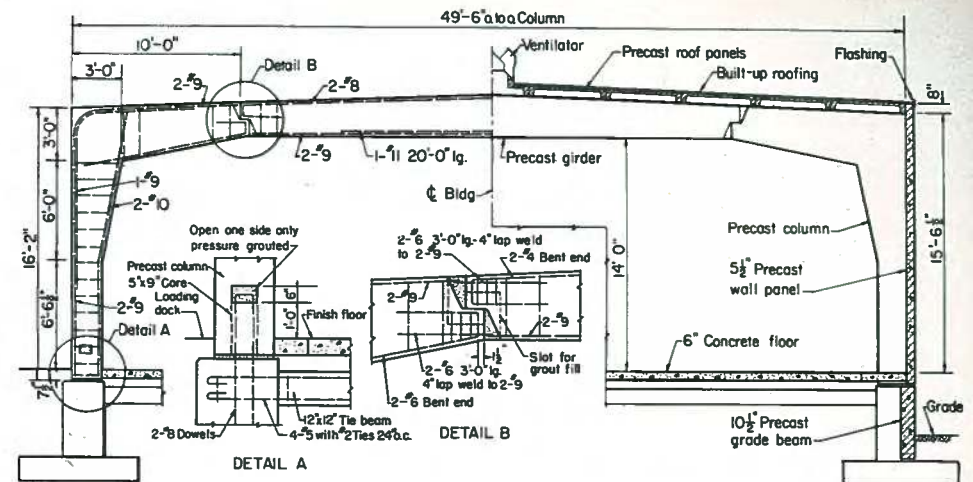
Typical one bay wide precast concrete warehouse as designed and built for the U.S. Navy during the early fifties when the Navy's extensive construction program reached its peak.
